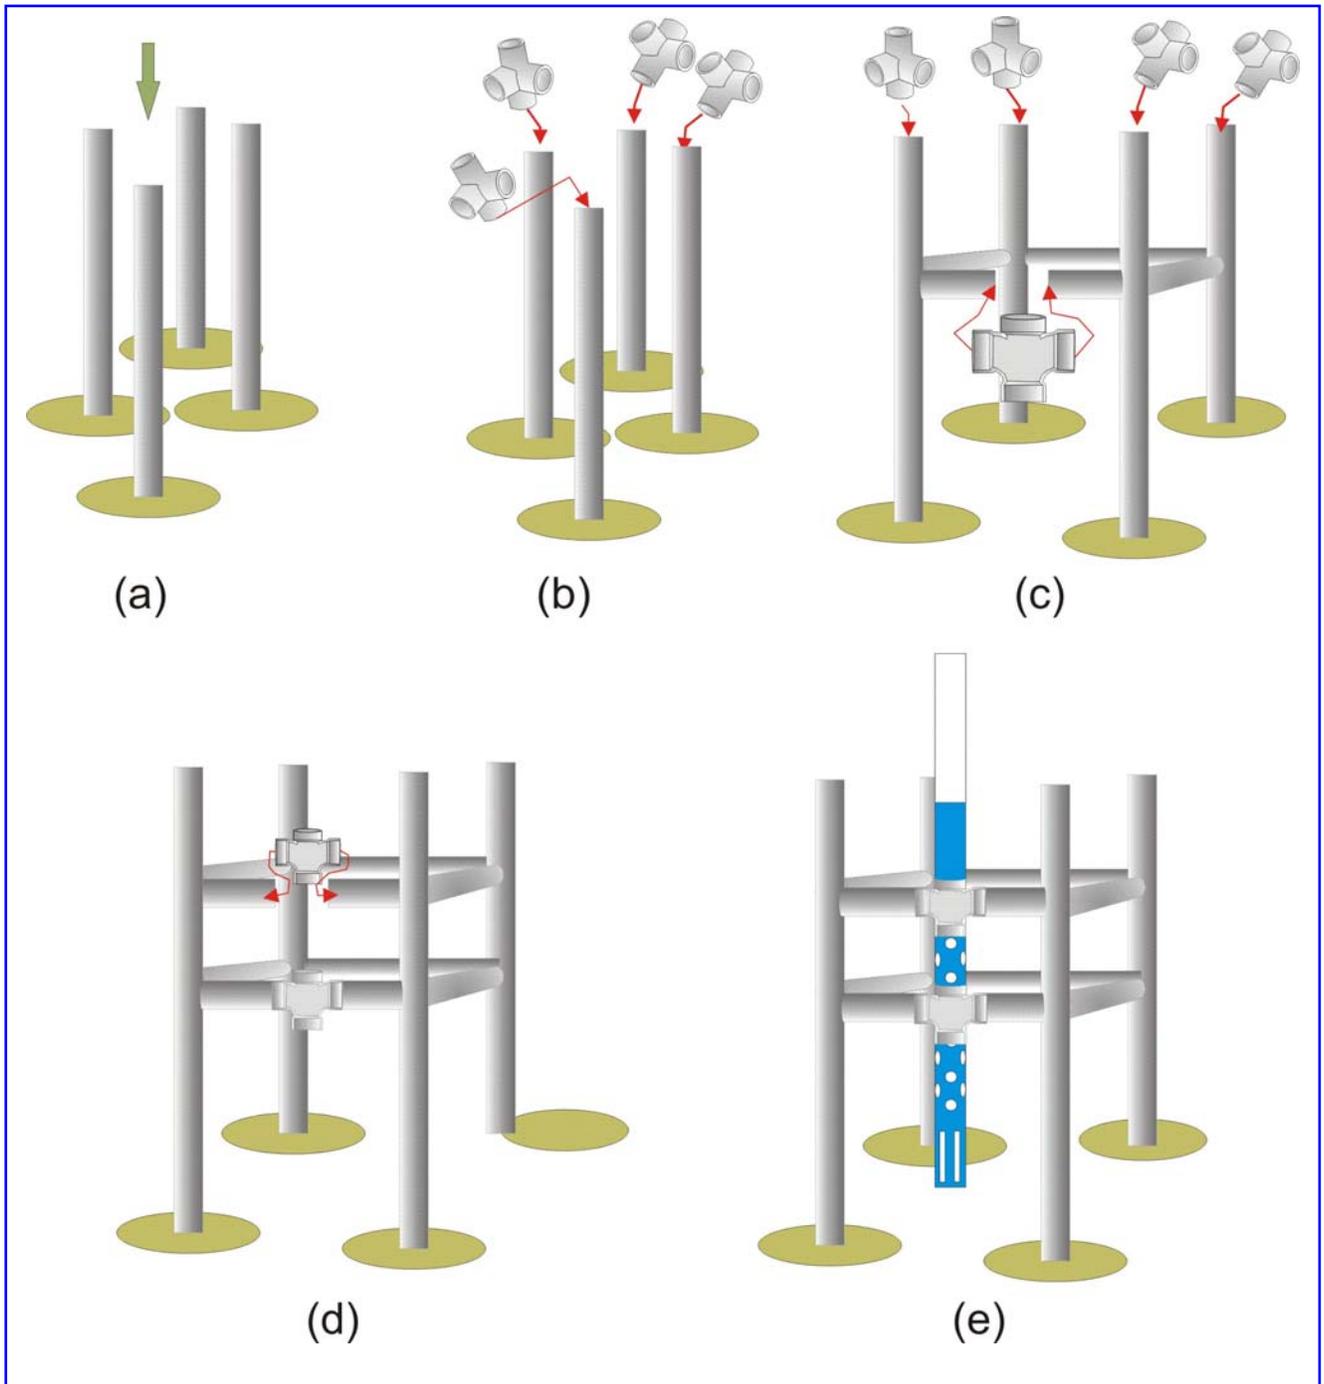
Sketch showing the construction steps of a four leg PVC structure
